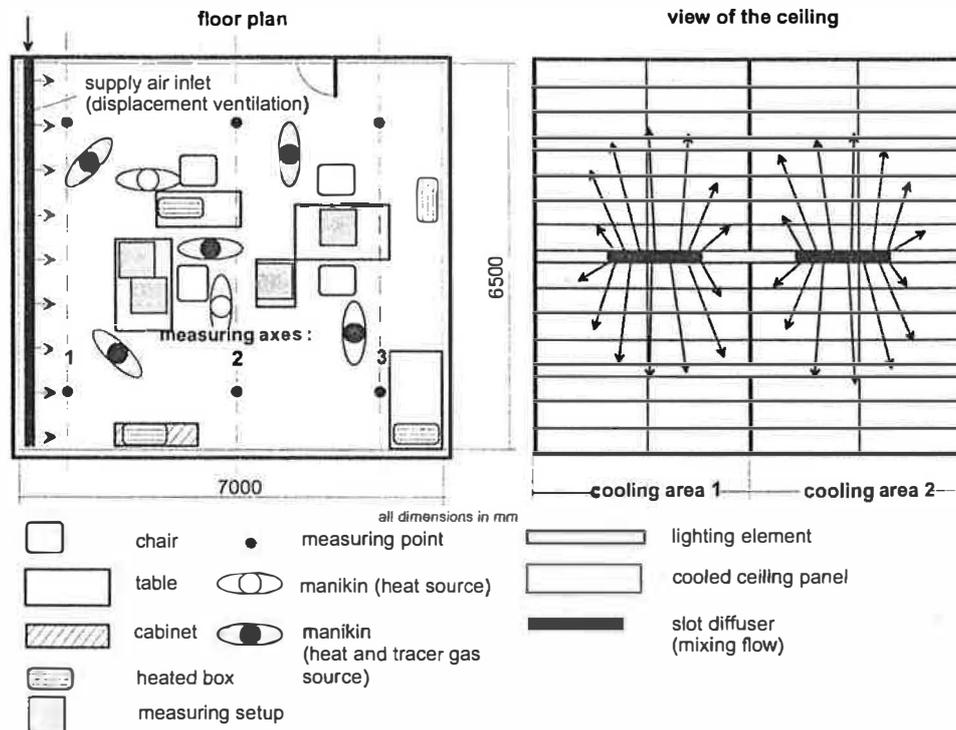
Floor plan and reflected ceiling plan of the test chamber, showing the heat source arrangement S1,2 and explaining the measuring points.
